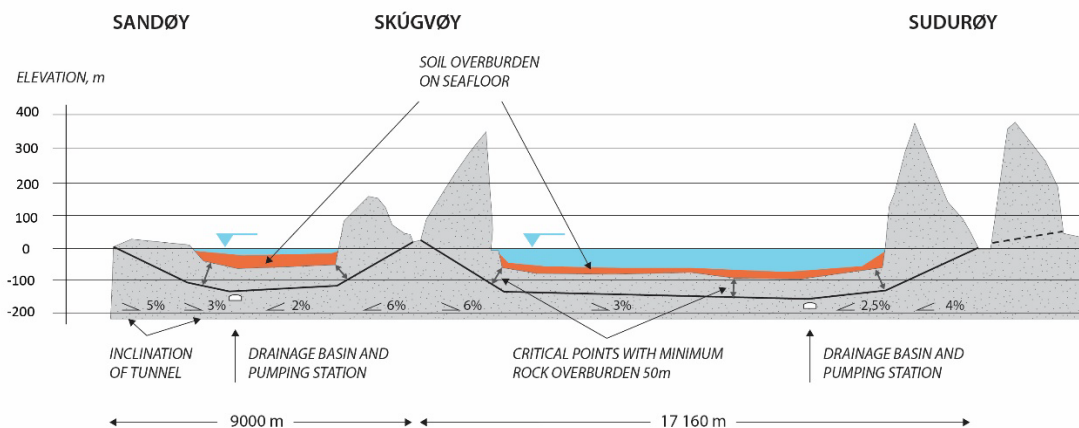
Tunnel alignment option 1 with two separate tunnels surfacing at Skugvøy. Longitudinal section.
